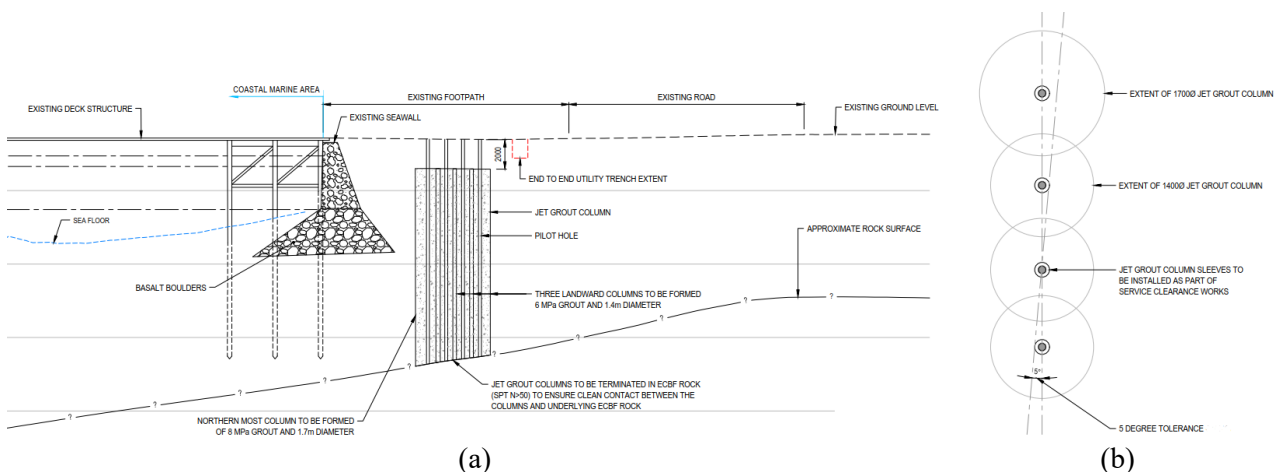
Typical cross section (a) and plan (b) of the proposed jet grout shear walls
